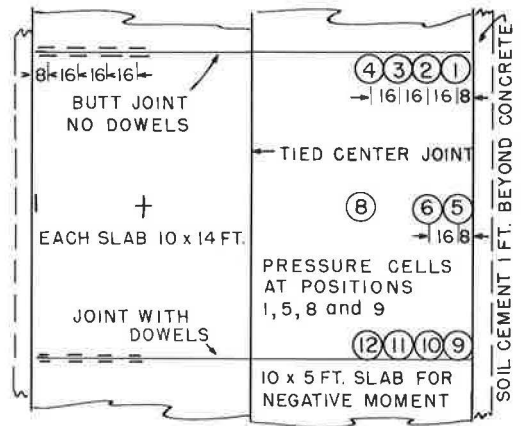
Gage and load locations for 10- x 1 1/4-ft slabs.
